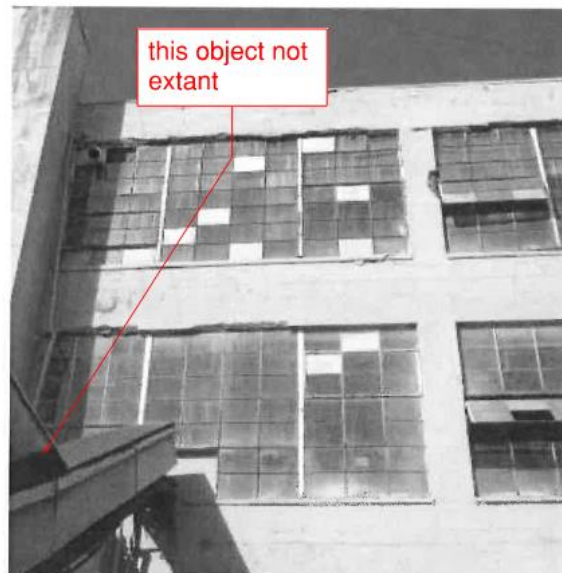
The distribution of cracks and spalls on the southern façade, at the second bay from the west. Knapp Architects photo, 2019.
